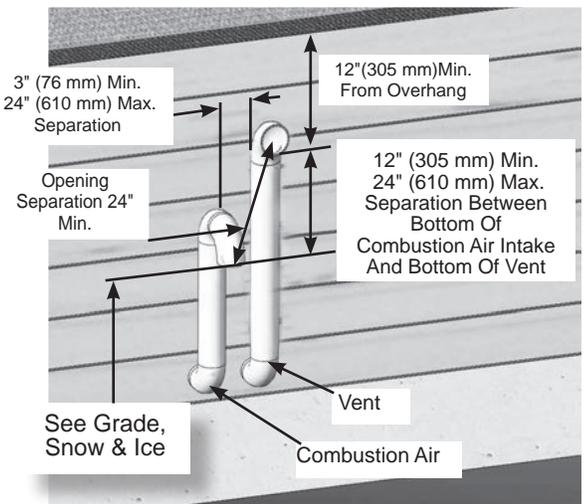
Twin Pipe Side Wall with 45° Vent
